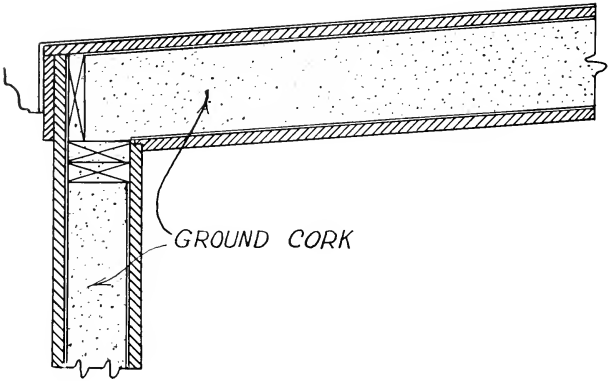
Section Showing Sill, Floor, Wall, and Ceiling Construction.
